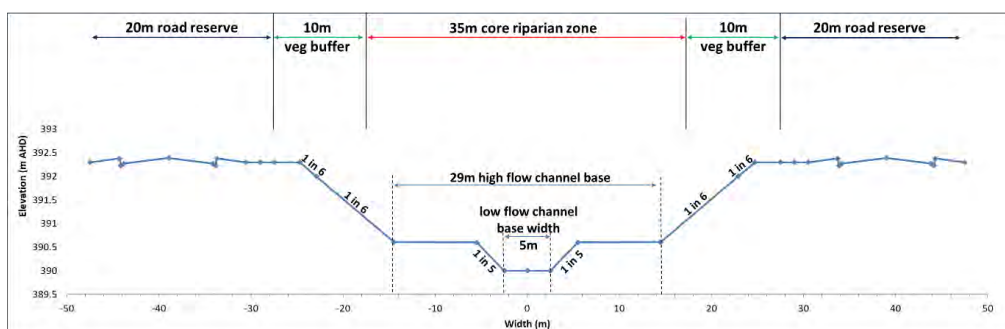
Conceptual arrangement of a typical cross section for a 55m wide waterway corridor
